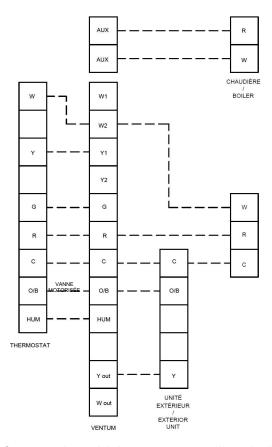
Example of connection with heat pump, auxiliary boiler and motorized valve
